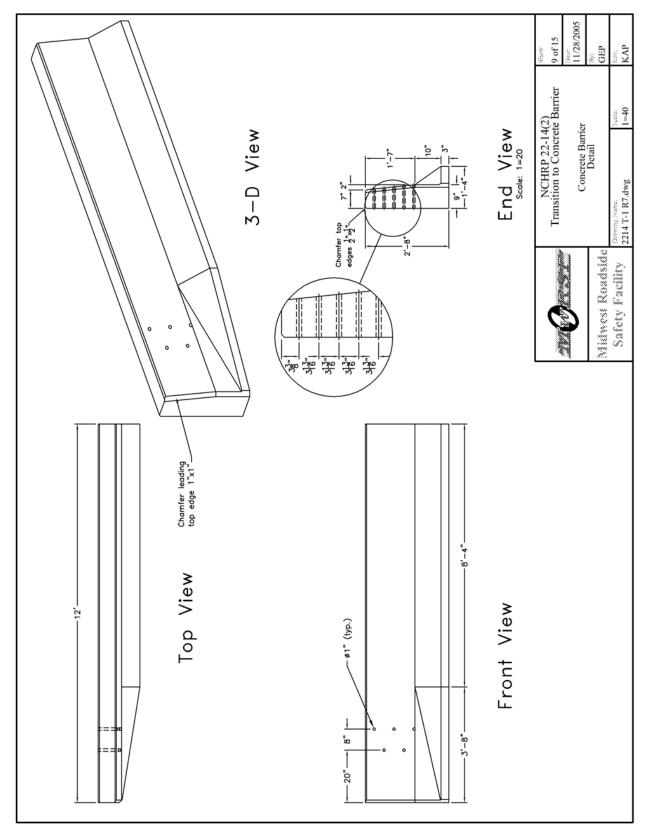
Approach Guardrail Transition to Concrete Barrier Design - Concrete Barrier Details (English)
